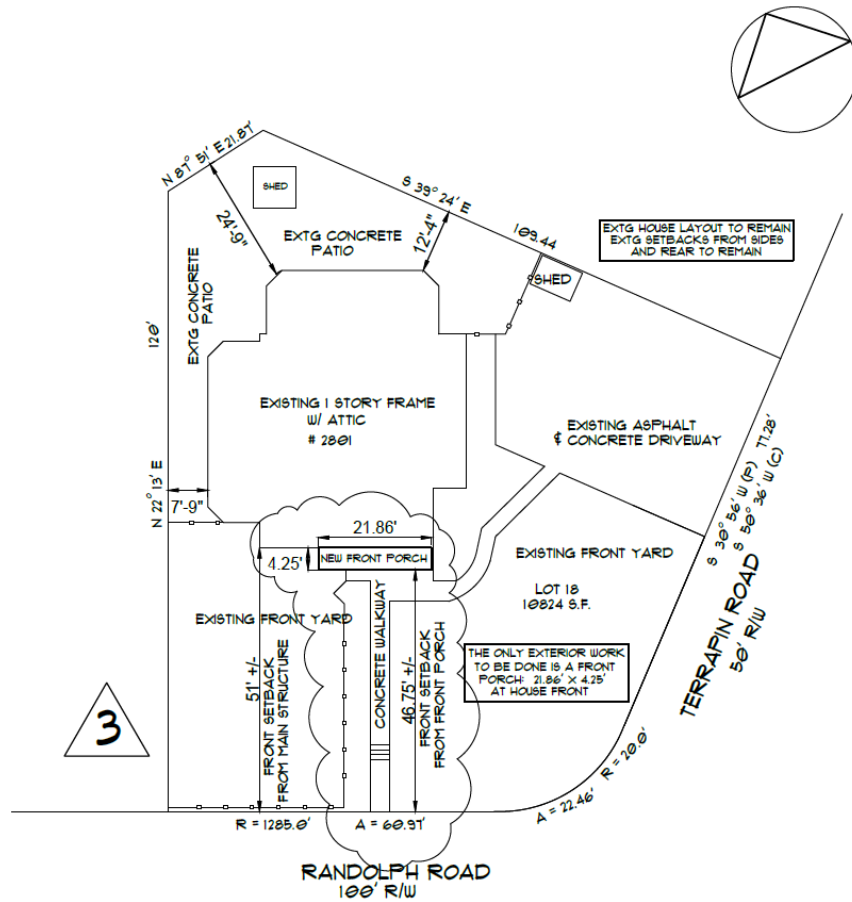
Existing Site Conditions with Proposed Porch Conversion
